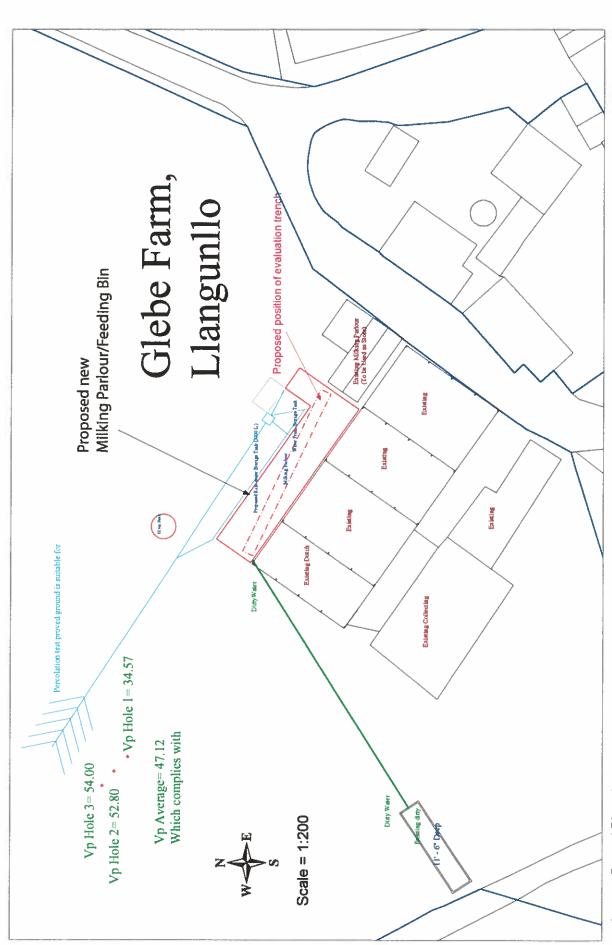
Ground Plan showing proposed new Milking Parlour and Feeding Bin at Glebe Farm, Llangunllo, with location of evaluation trench high-lighted.
